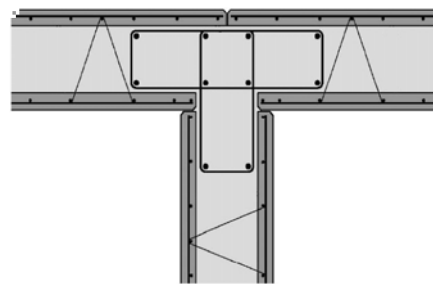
"T" joint (three panel connection) example with prefabricated rebar cage connecting panels.
